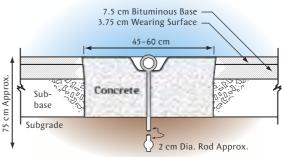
Tiedown Anchors for Bituminous Paved Areas
